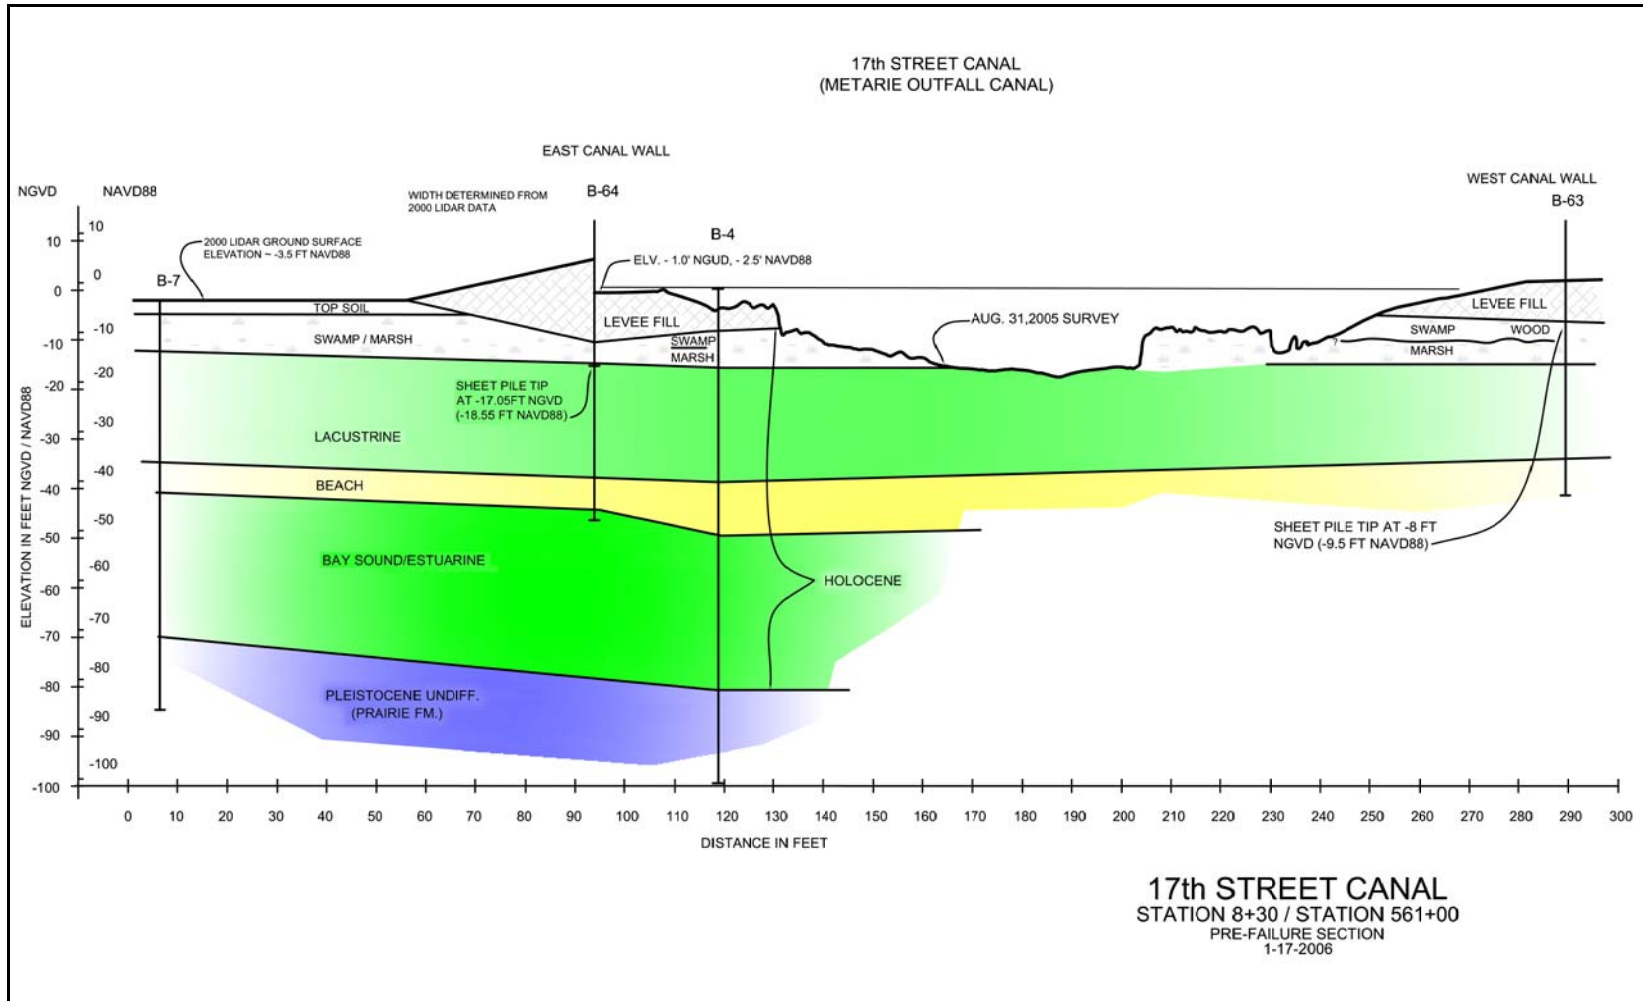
Prefailure Cross-Section at Sta 8+30 (New Stationing)/ Sta. 561+00 (GDM Stationing)
